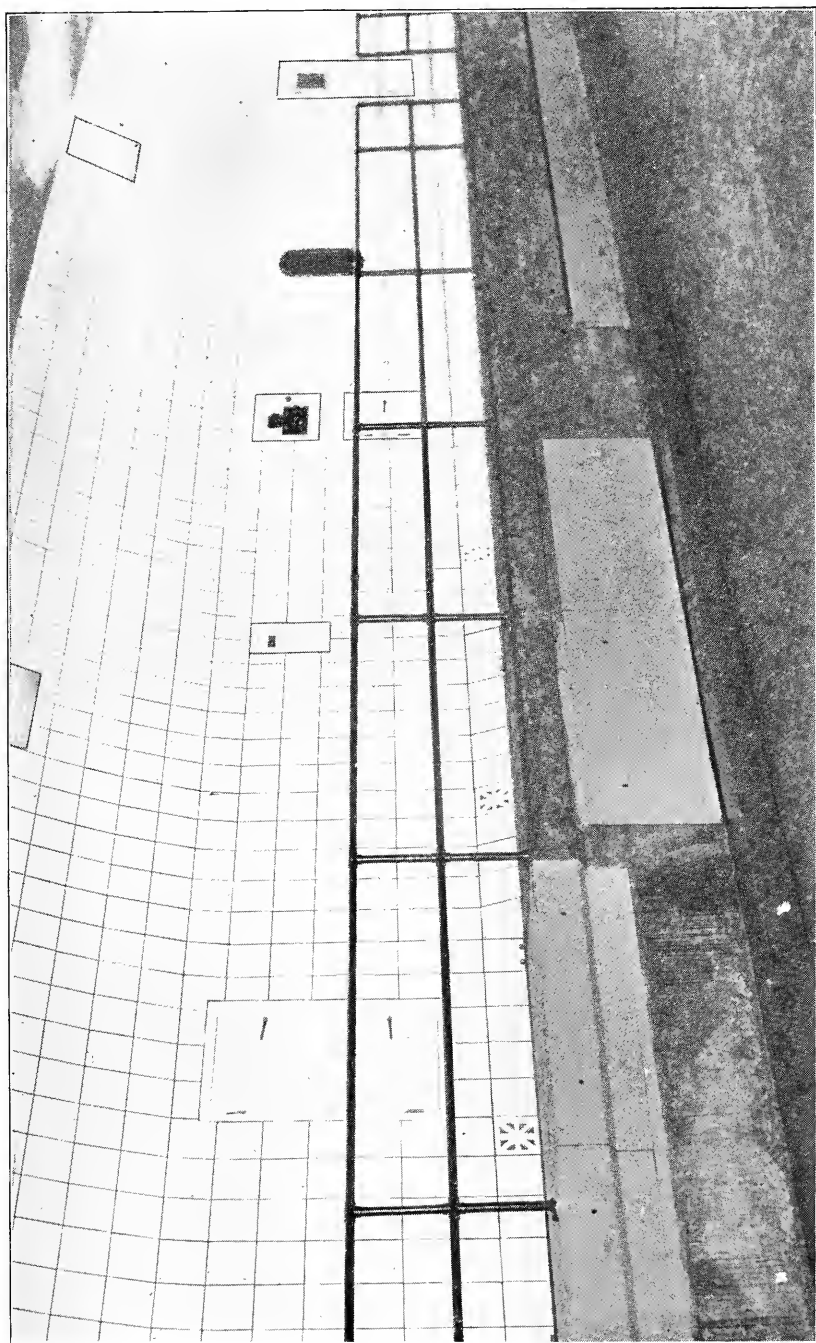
PLATE VII.—SIGNAL CONTROL NICHE GROUP IN NORTH WALL OF TUNNEL.
